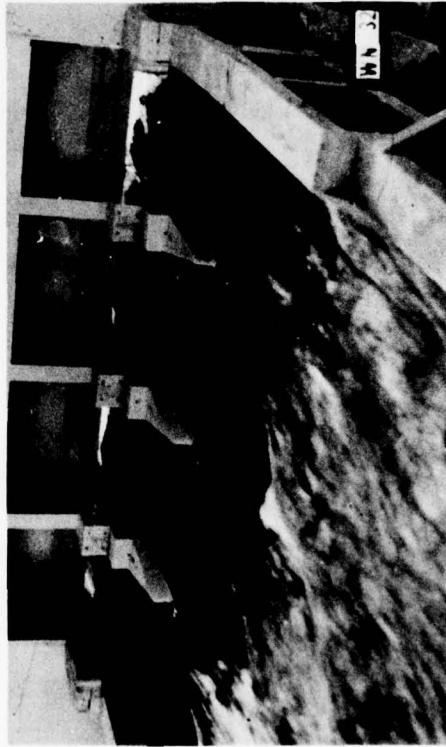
Test 4, unsymmetrical piers. Middle pier tapered, outside piers beveled inward.
